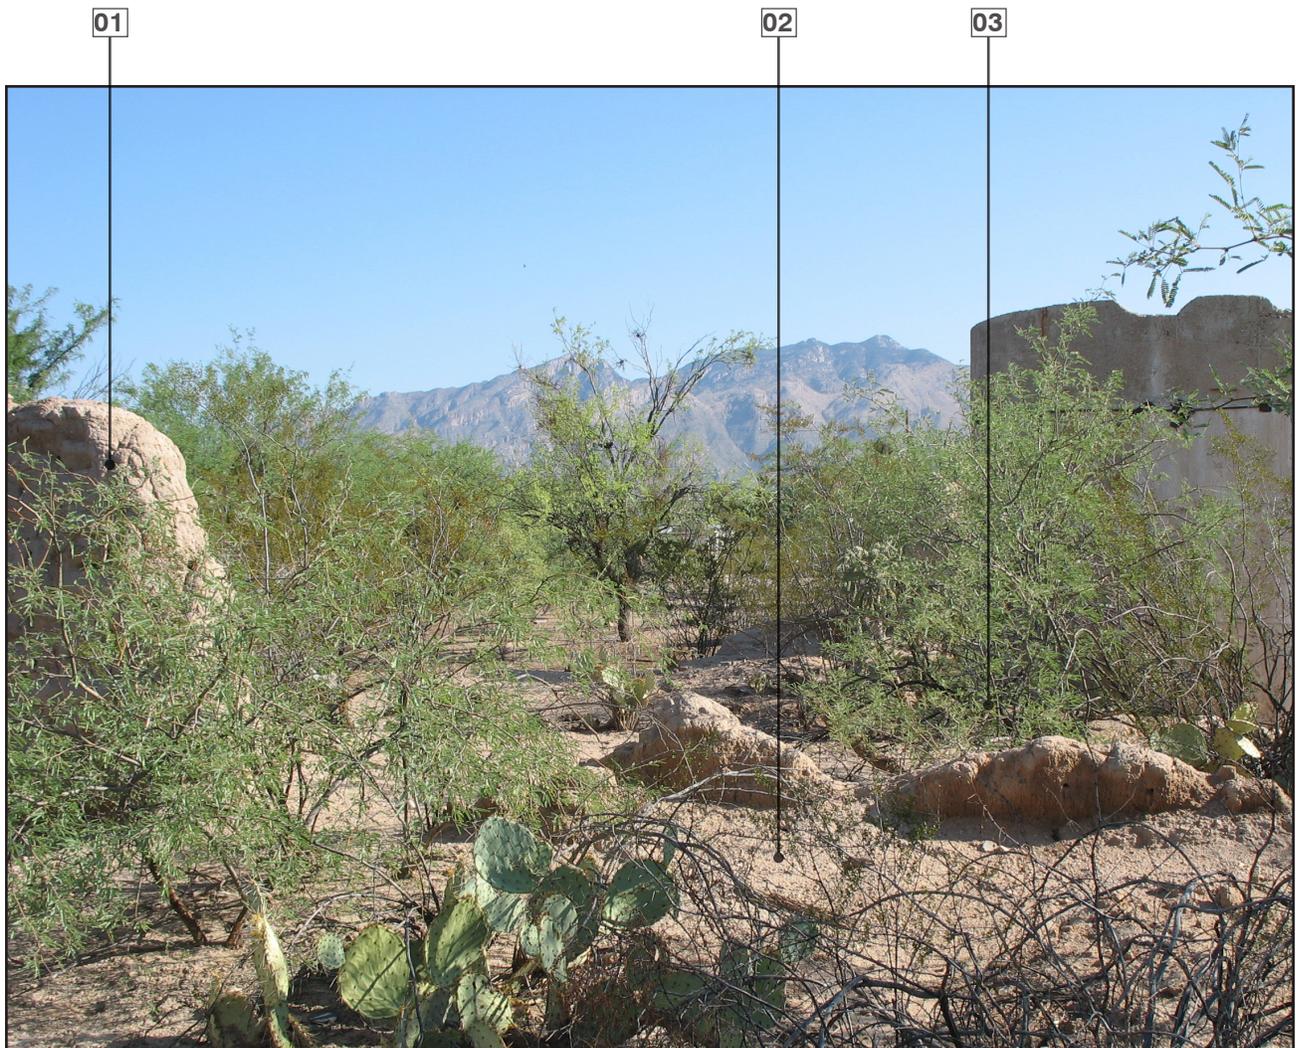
East elevation of Officer's Quarters No. 1 and Kitchen No.1
